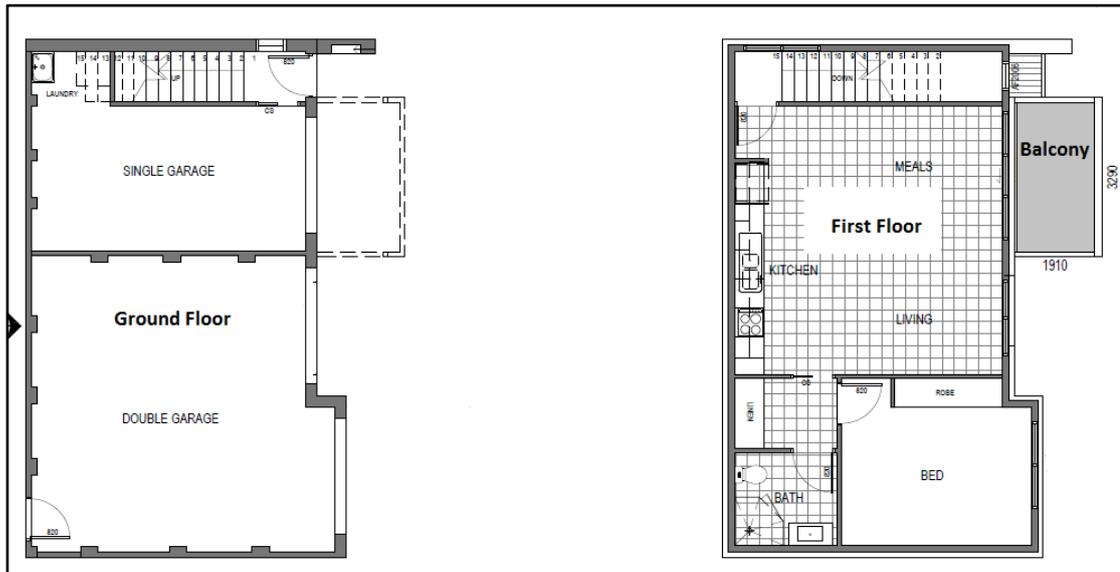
Typical Floor Plan of Type 11 Dwelling
